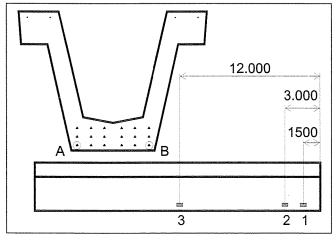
Arrangement of tendons in an UBx type prestressed concrete beam and the location of sensors
